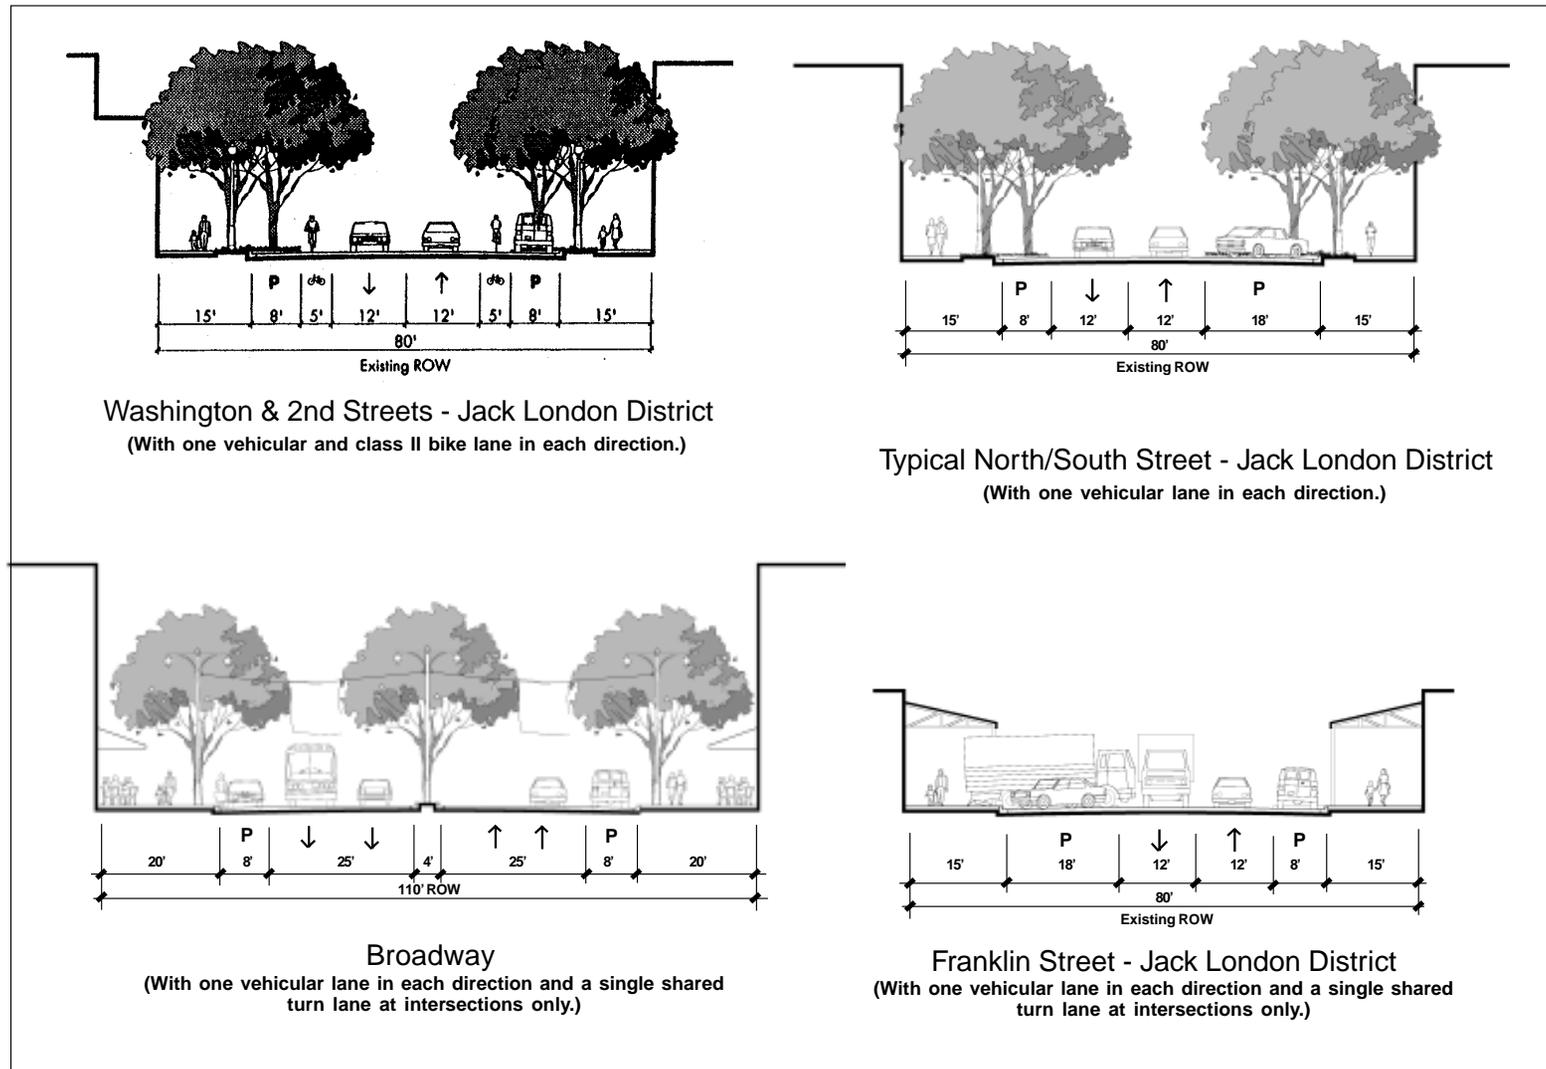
=: Jack London District Illustrative Street Cross Sections
